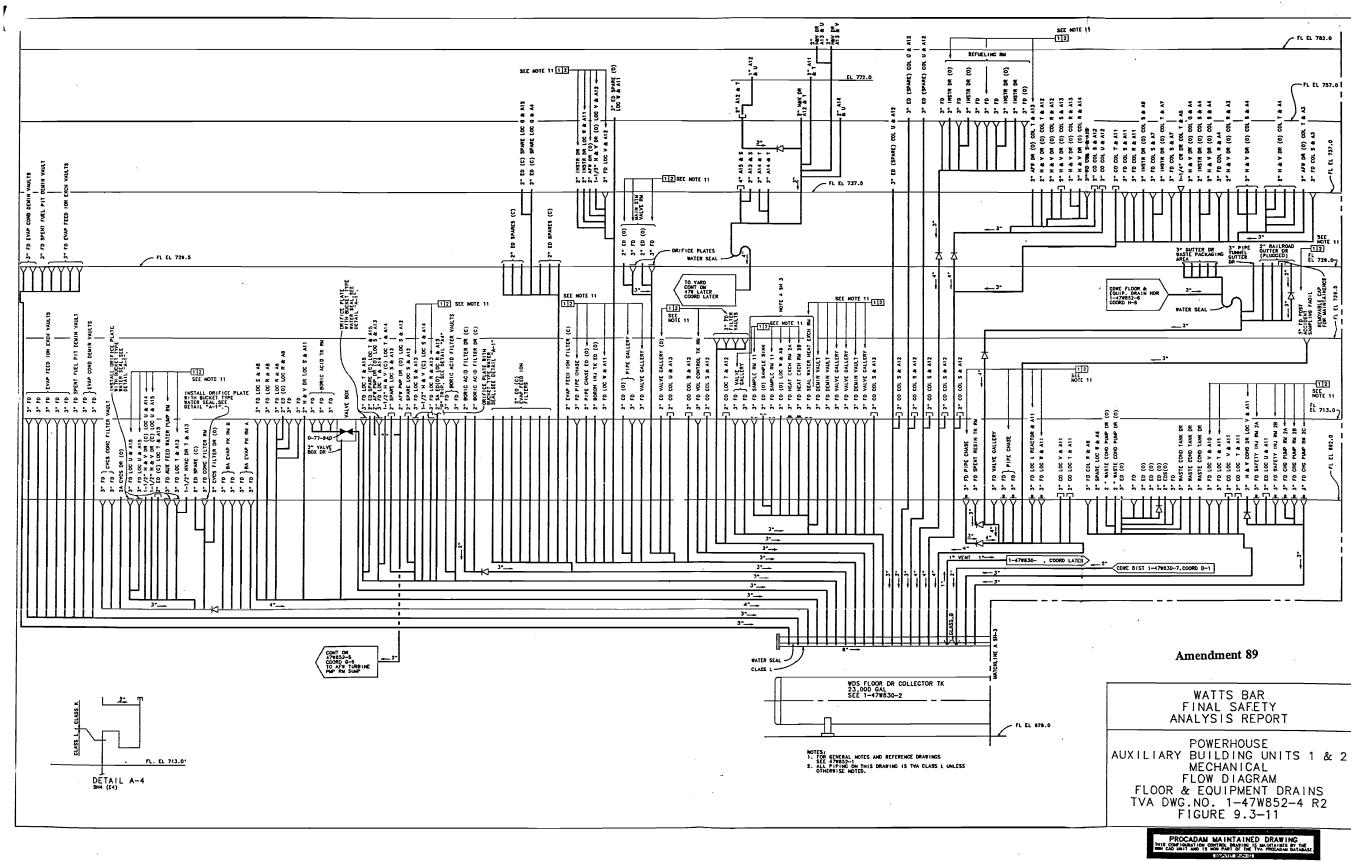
Powerhouse Auxiliary Building Units 1 & 2 Flow Diagram - Floor and Equipment Drains
